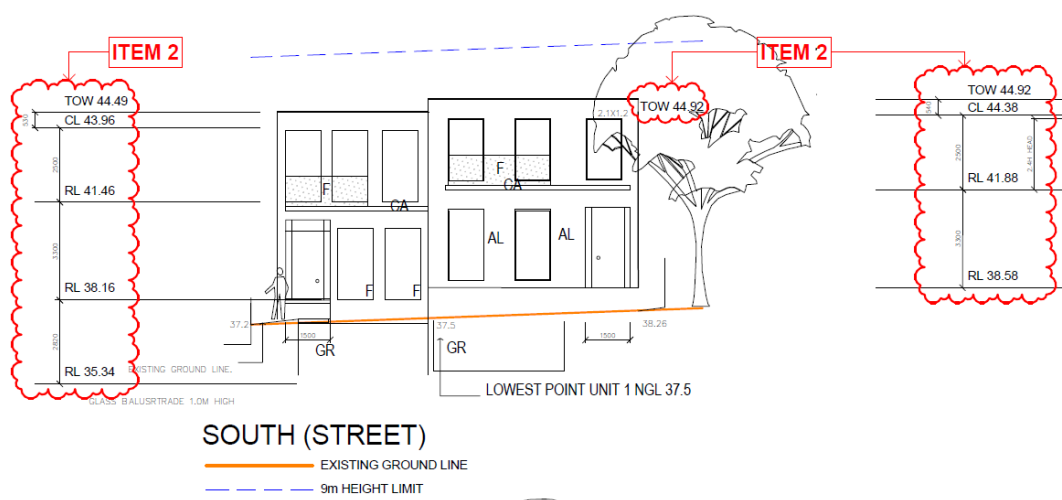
Proposed streetscape elevation of DA Approved 17 Hillview Avenue, Bankstown
